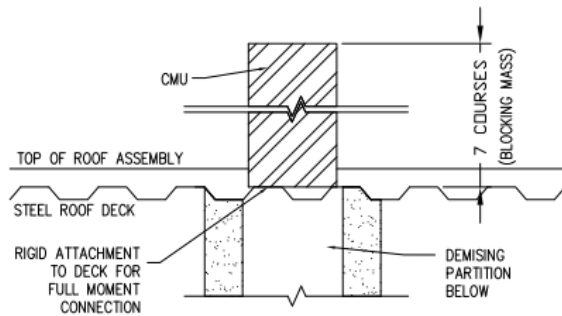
Proposed CMU blocking mass installed directly on the roof deck.
